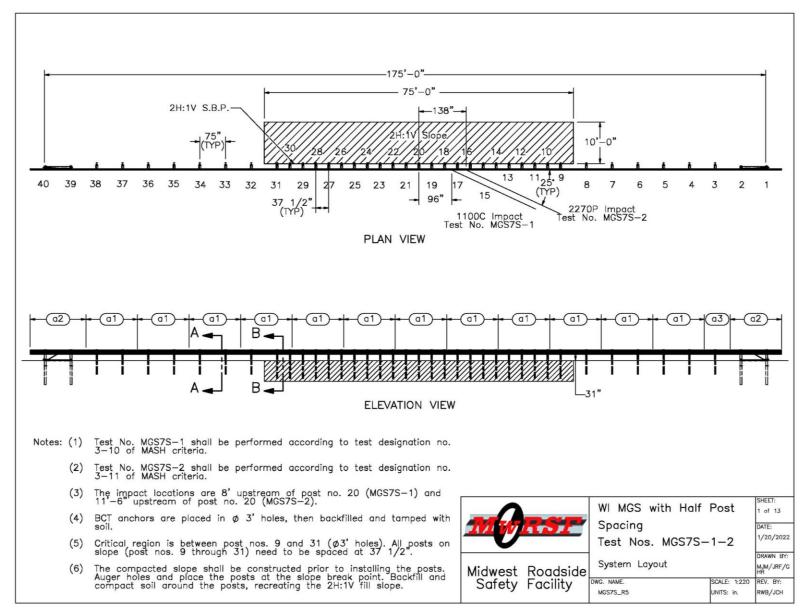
Test Installation Layout, Test Nos. MGS7S-1 and MGS7S-2
